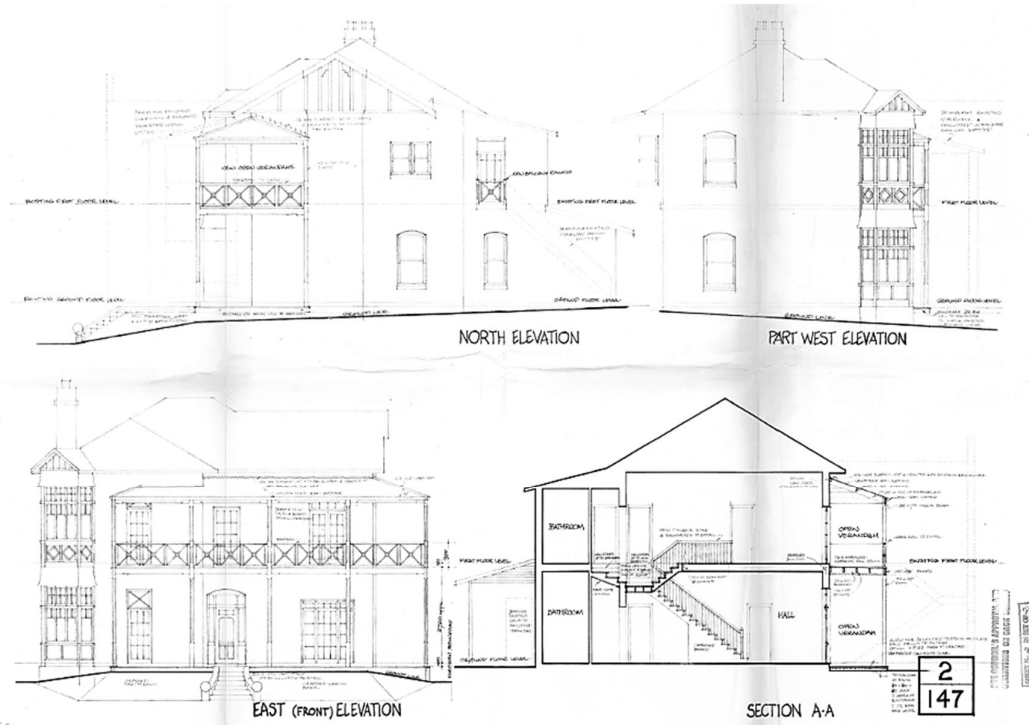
Approved plans from 1975 to add verandah to the dwelling.
